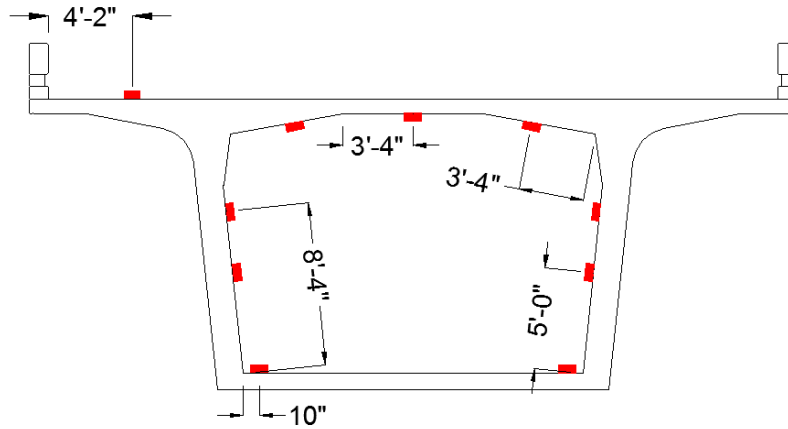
Smart Road Bridge Section B Transverse Strain Instrumentation – Looking in the Direction of Southbound Traffic
